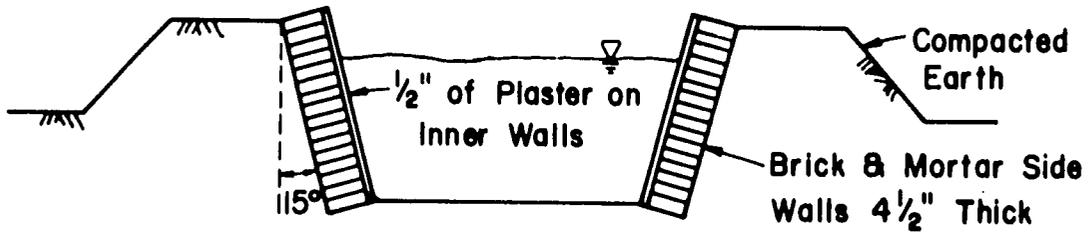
Masonry walls 4.5" thick which have collapsed due to soil and water pressure.
